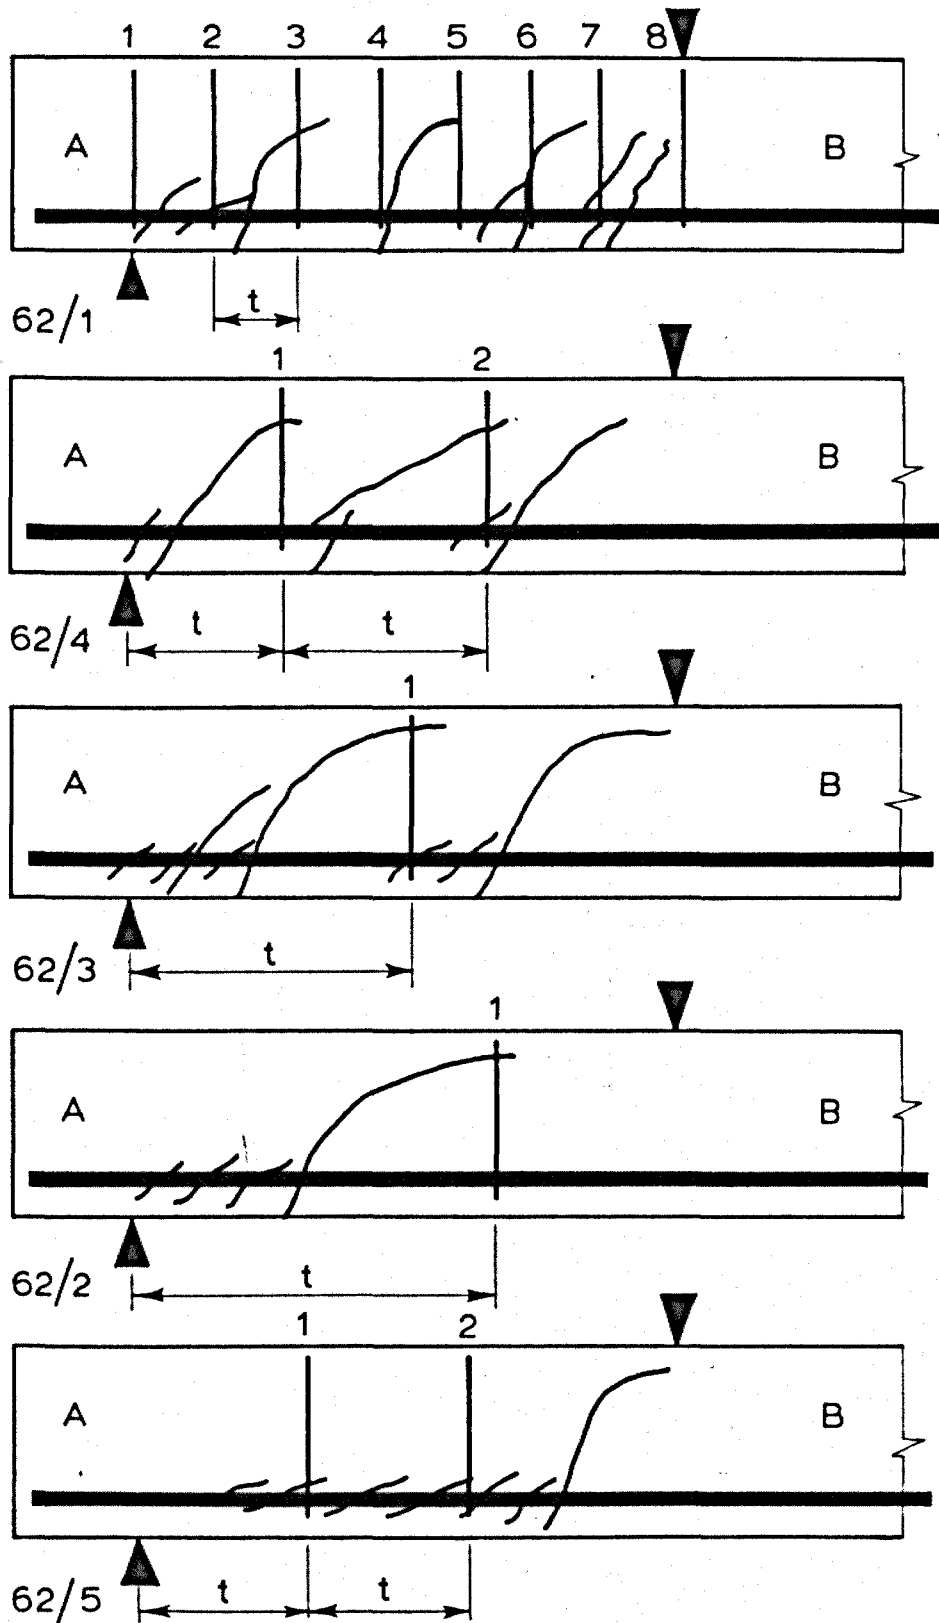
LAYOUT OF TEST BEAMS-RÜSCH AND MAYER
